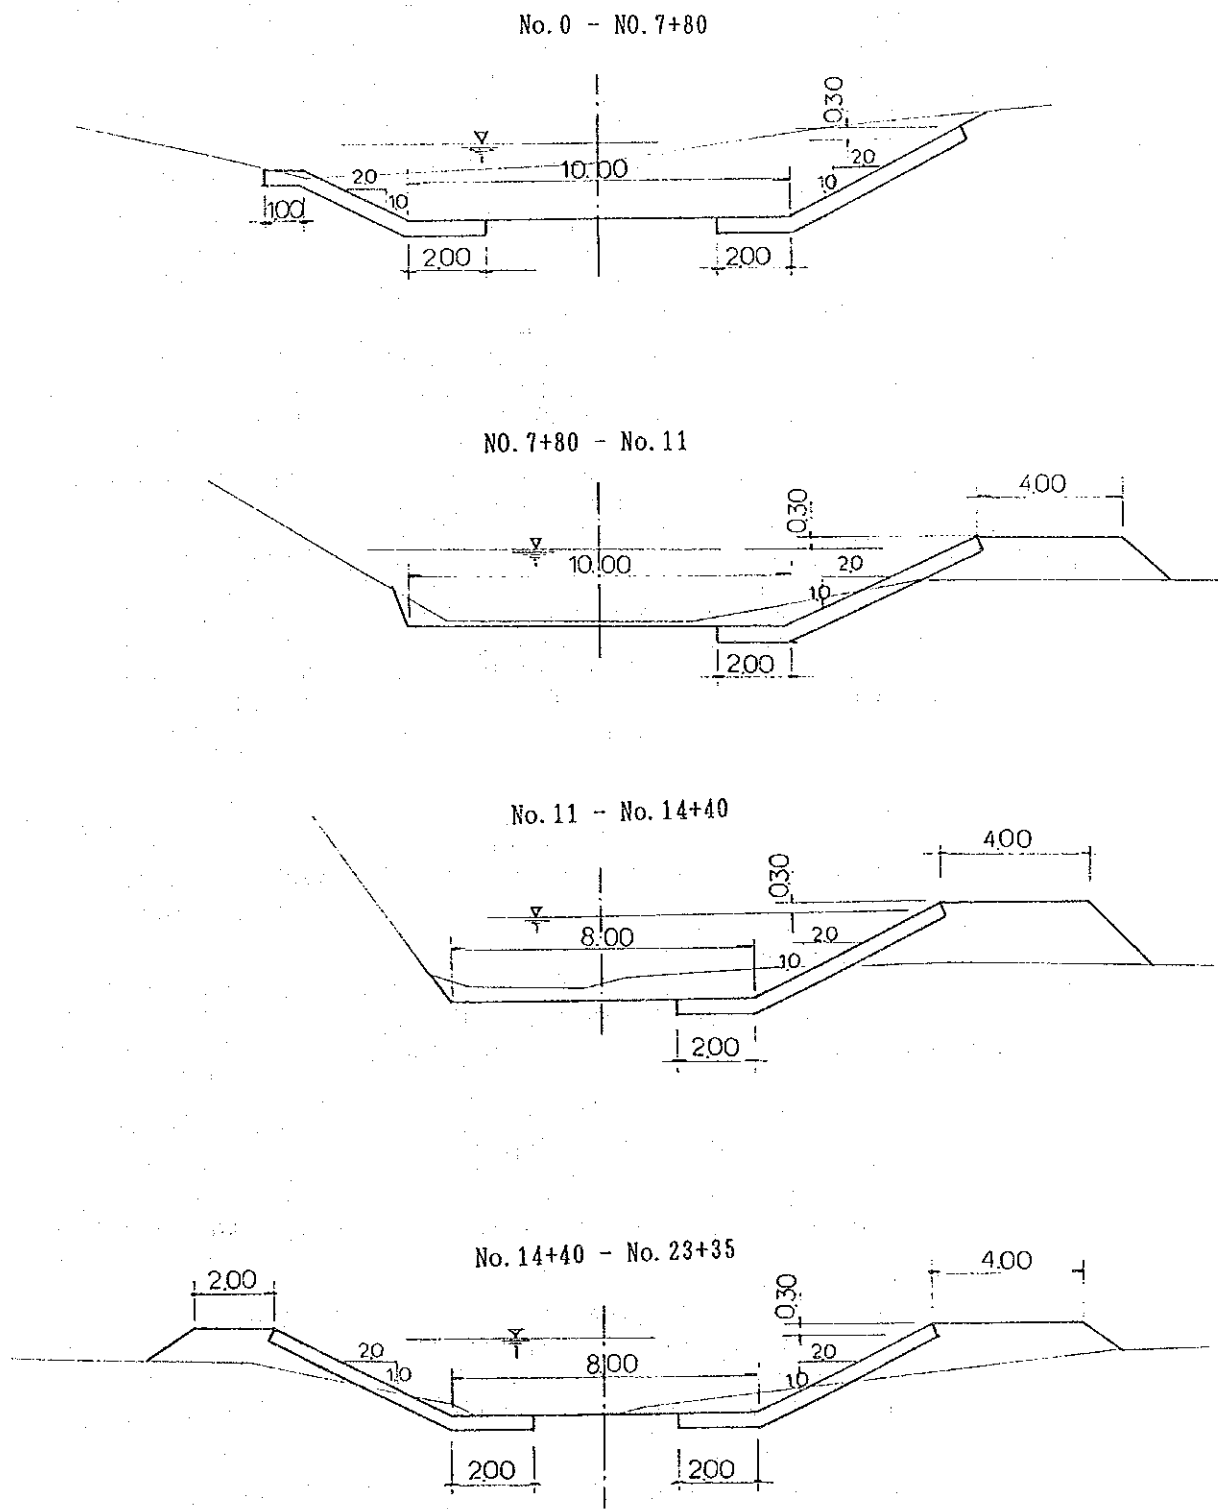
Typical Cross Section — Gyebjana Rongchu River
